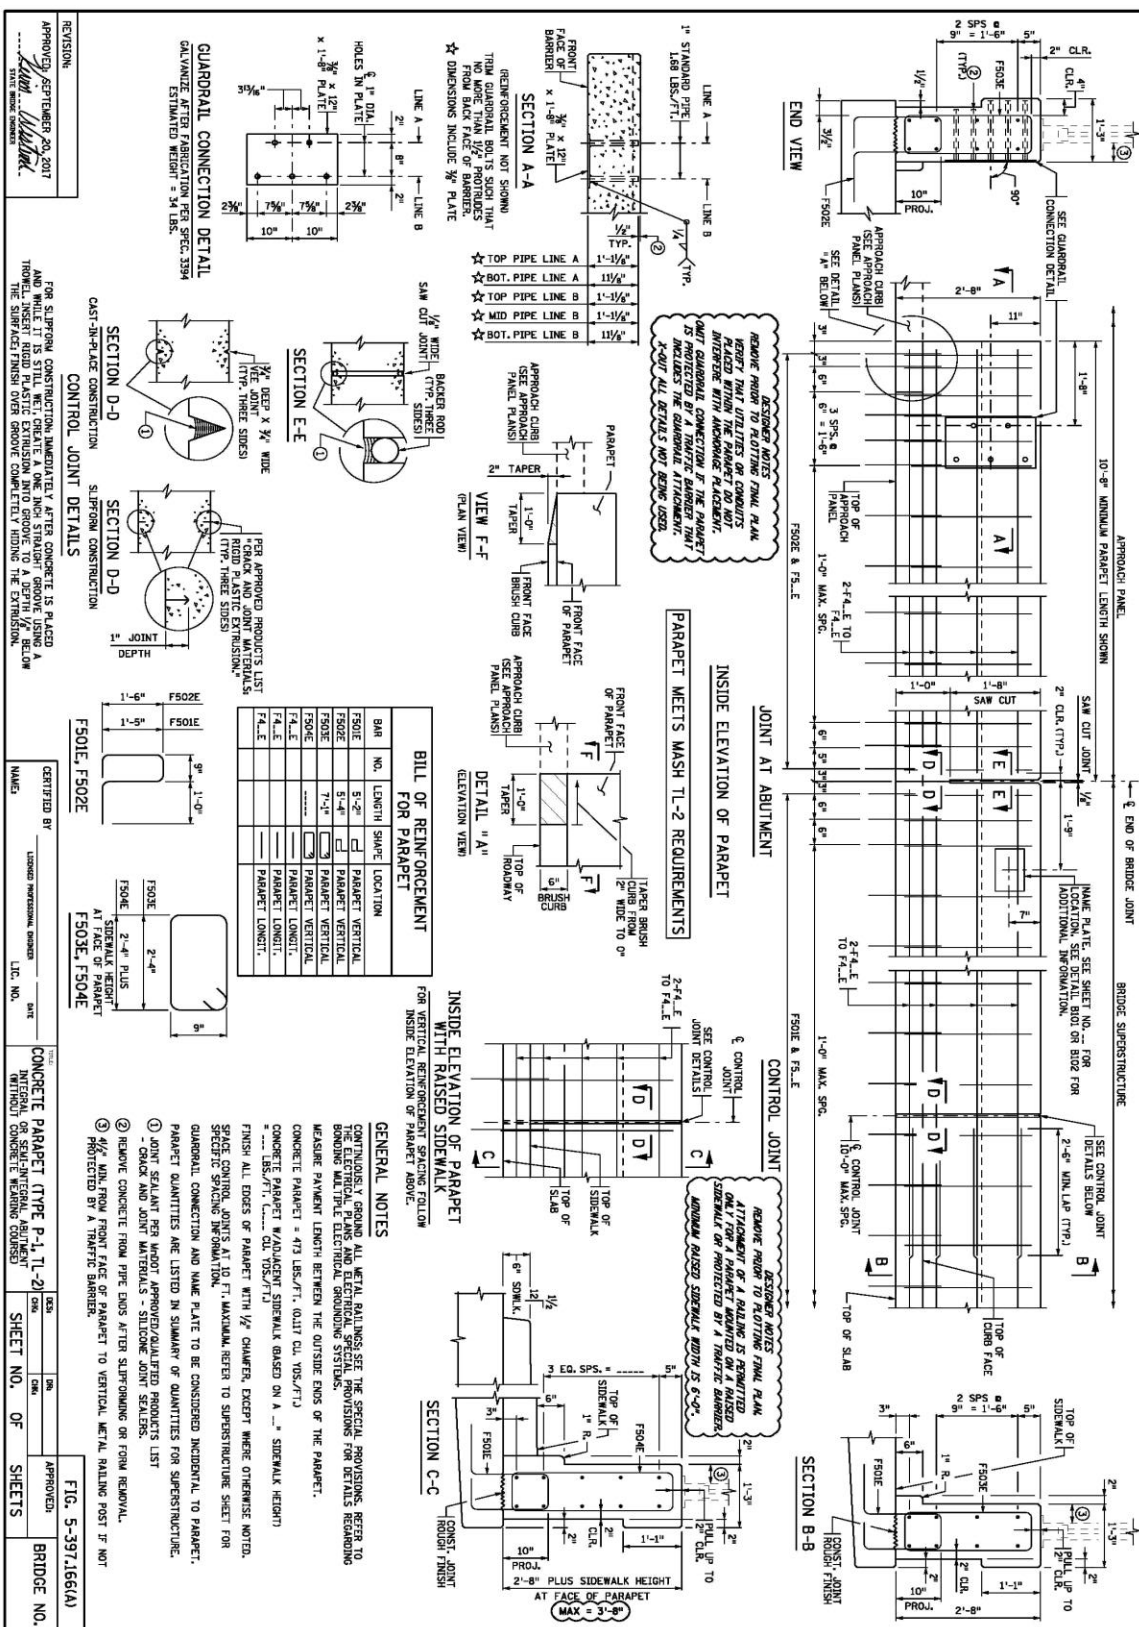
Minnesota Concrete Parapet Type P-1 [10]
